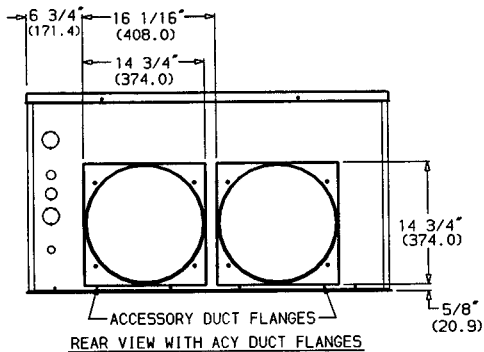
Dimensions; 657A024,030 Without Base Rail
